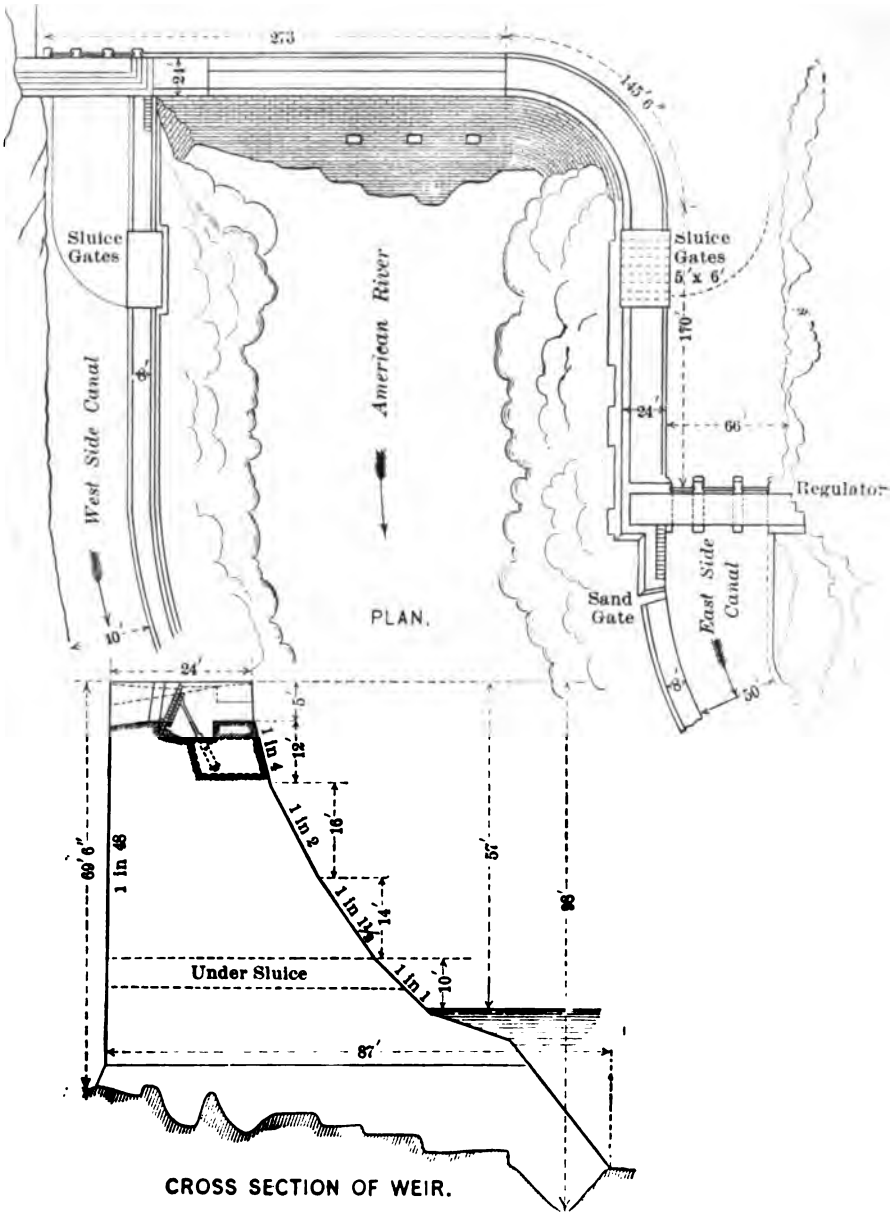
PLATE XXXI.—Folsom Canal Plan and Cross-section of Weir.
